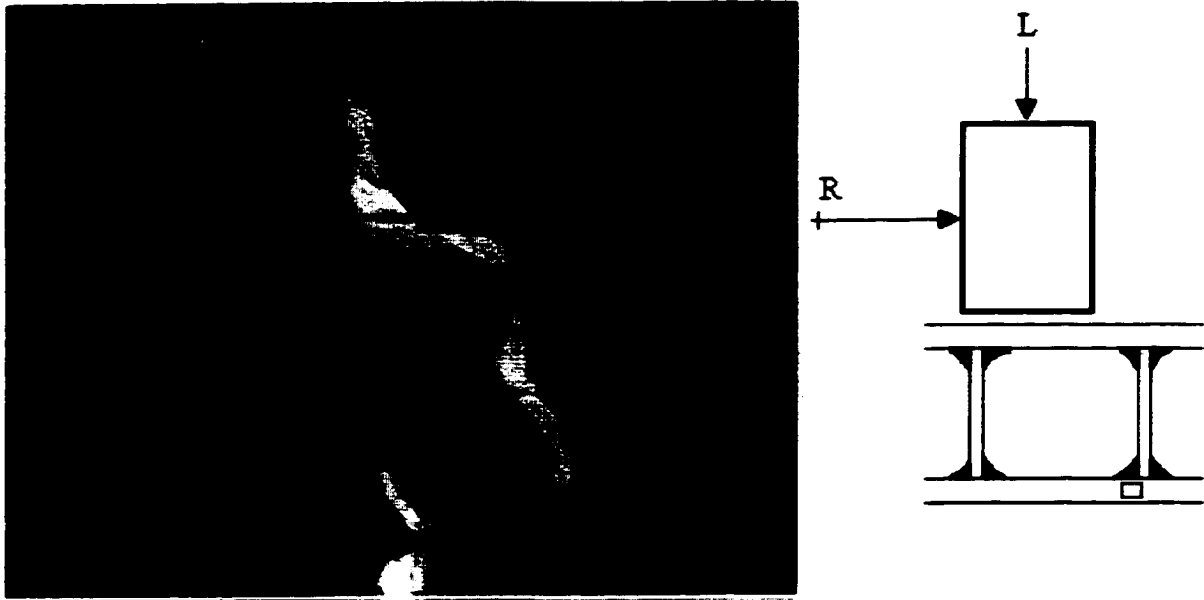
Fracture face friction along the fracture path. Note the smoothed mismatched fracture surfaces due to face friction. (R) Radius of roller cart rotation, (L) Load applied by roller cart wheel.
